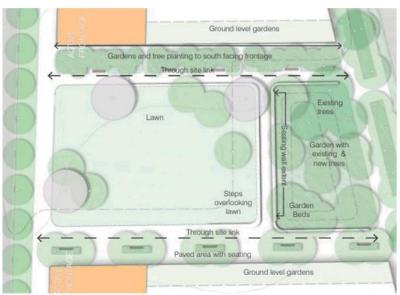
Built Form and Open Space Diagram- Indicative Concept for proposed park
